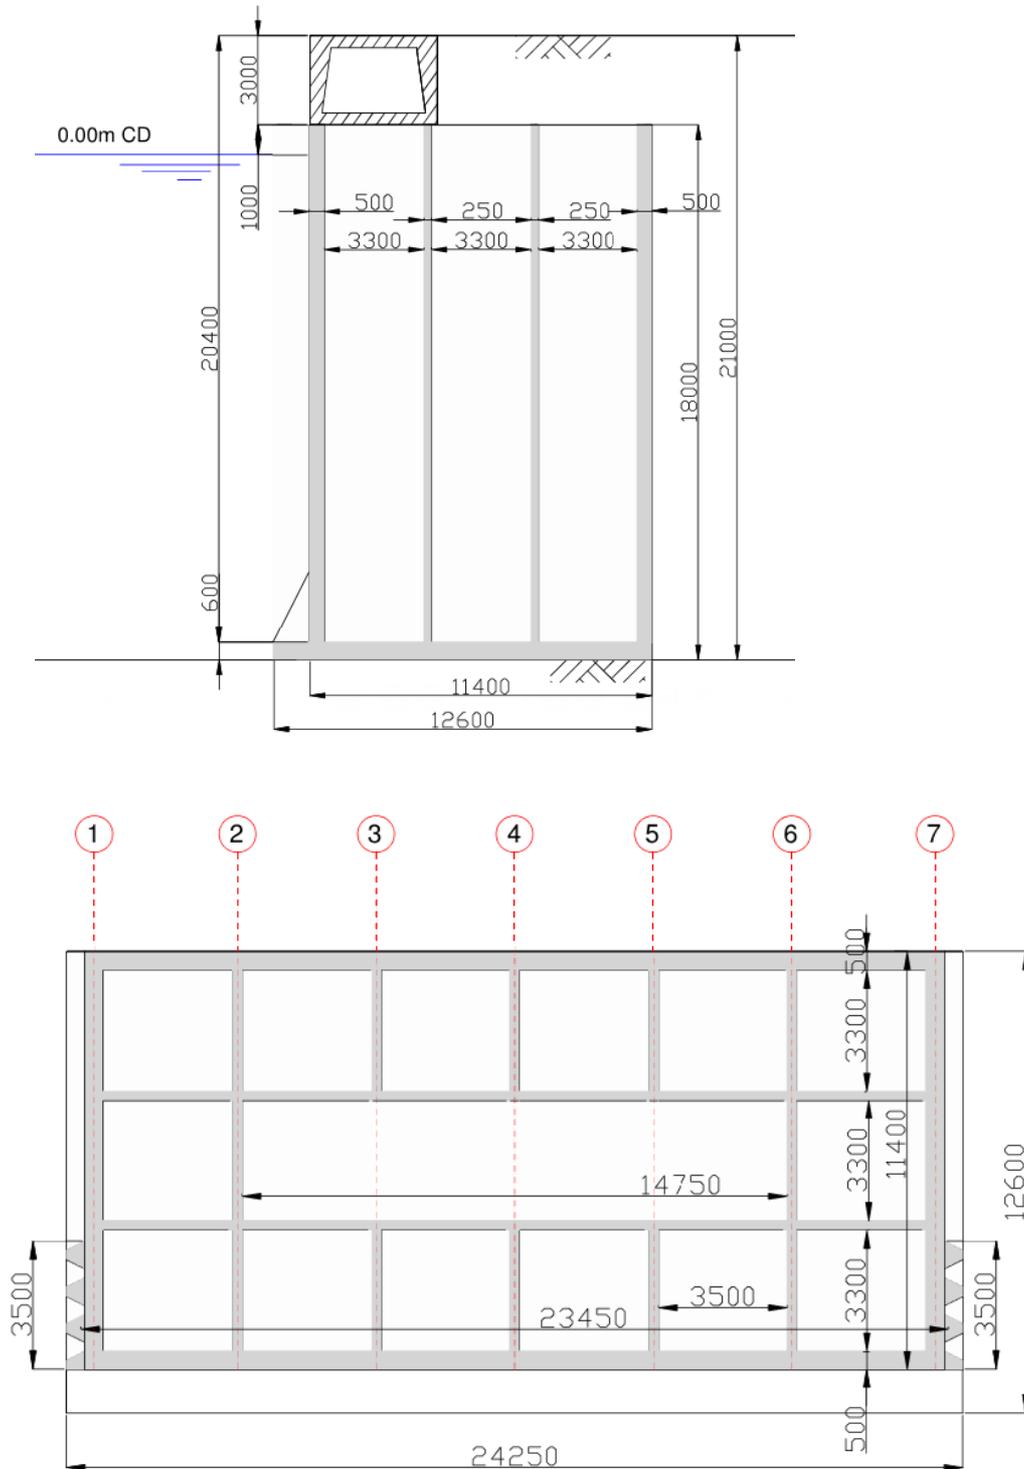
Cross-sections of the rectangular caisson (12.60m)
